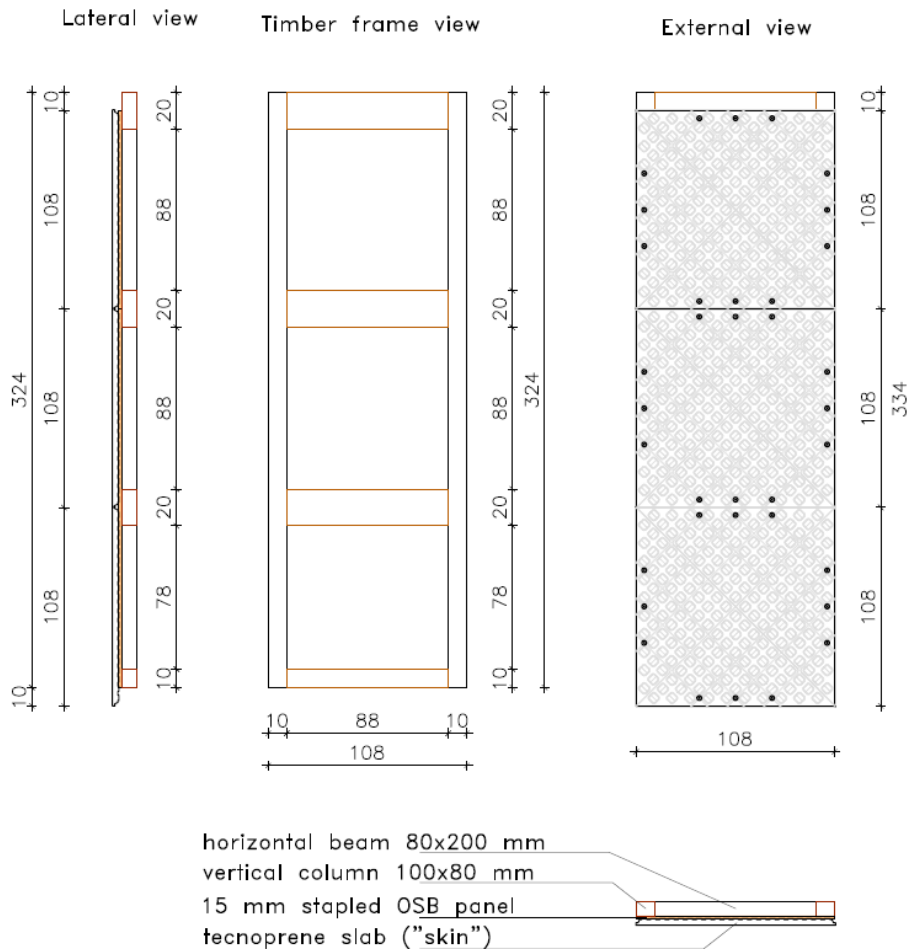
View of the modular shear wall (dimensions in cm).
